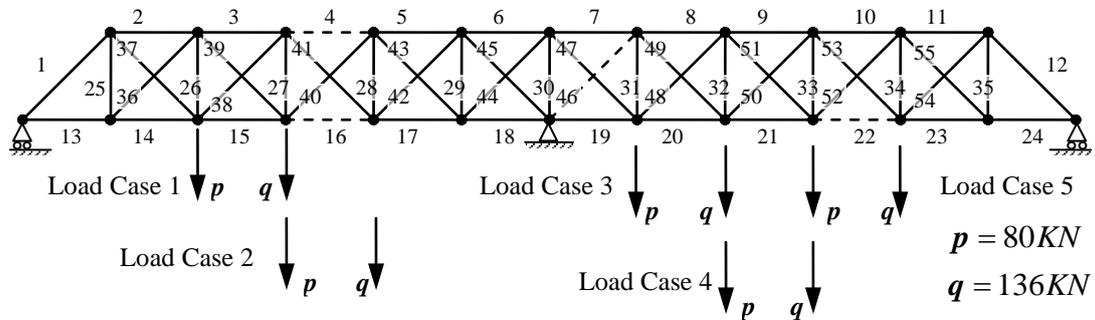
Damaged members and load cases of bridge truss.
